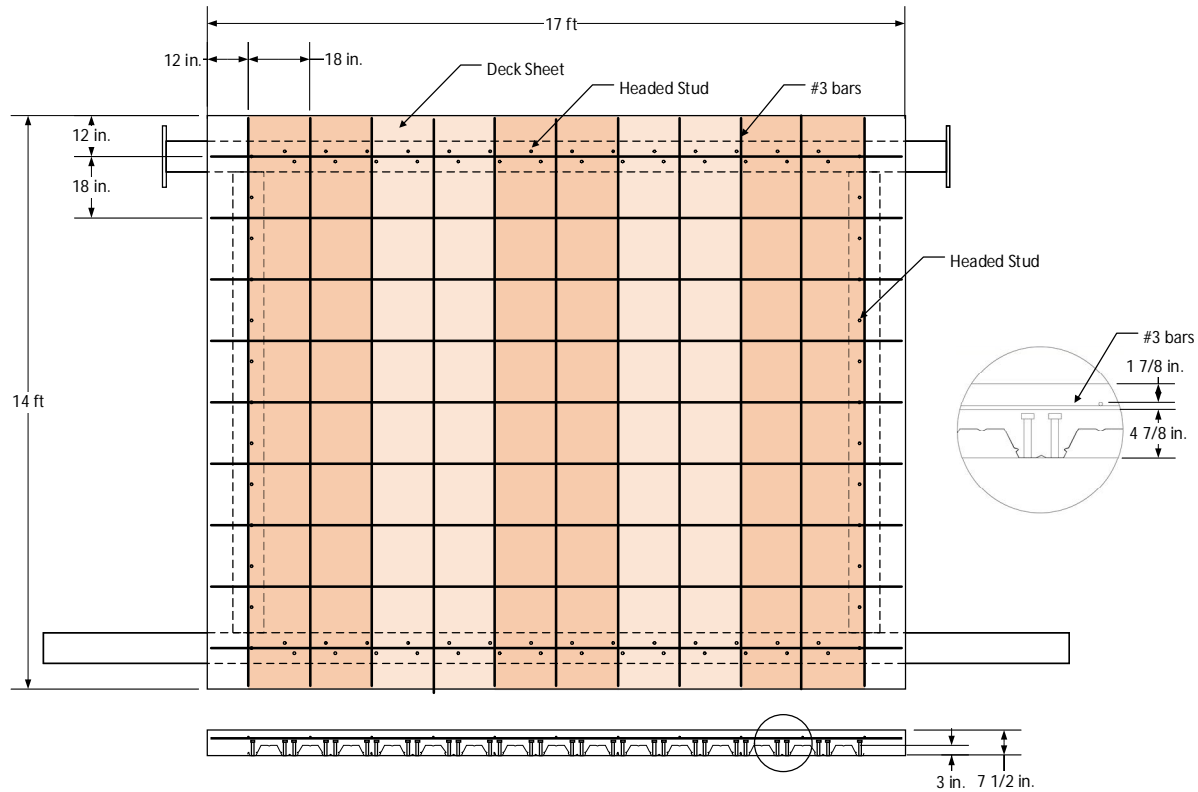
Reinforcement Arrangement for Specimen 3/7.5-4-N-RS
